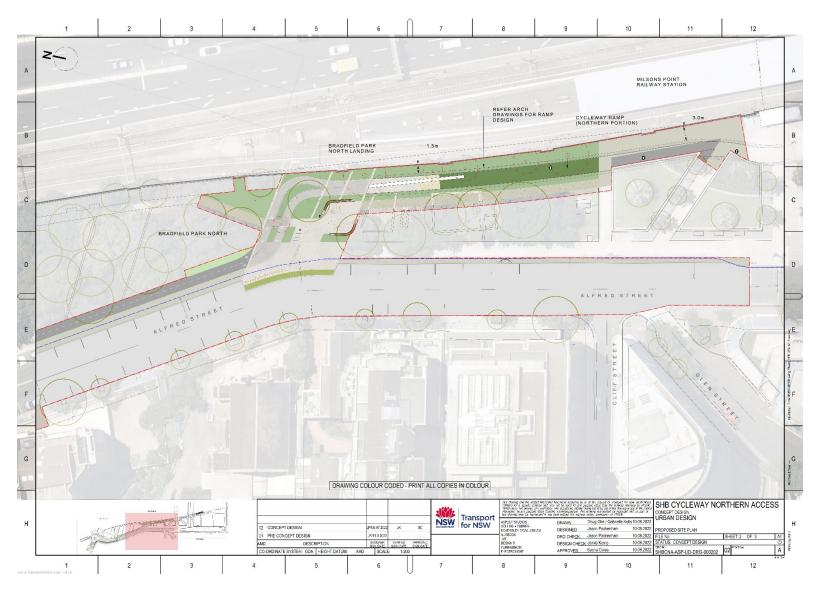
General Arrangement Plan: Bradfield Park bike ramp landing (Source: Urban Design drawings, Aspect, 2022)
